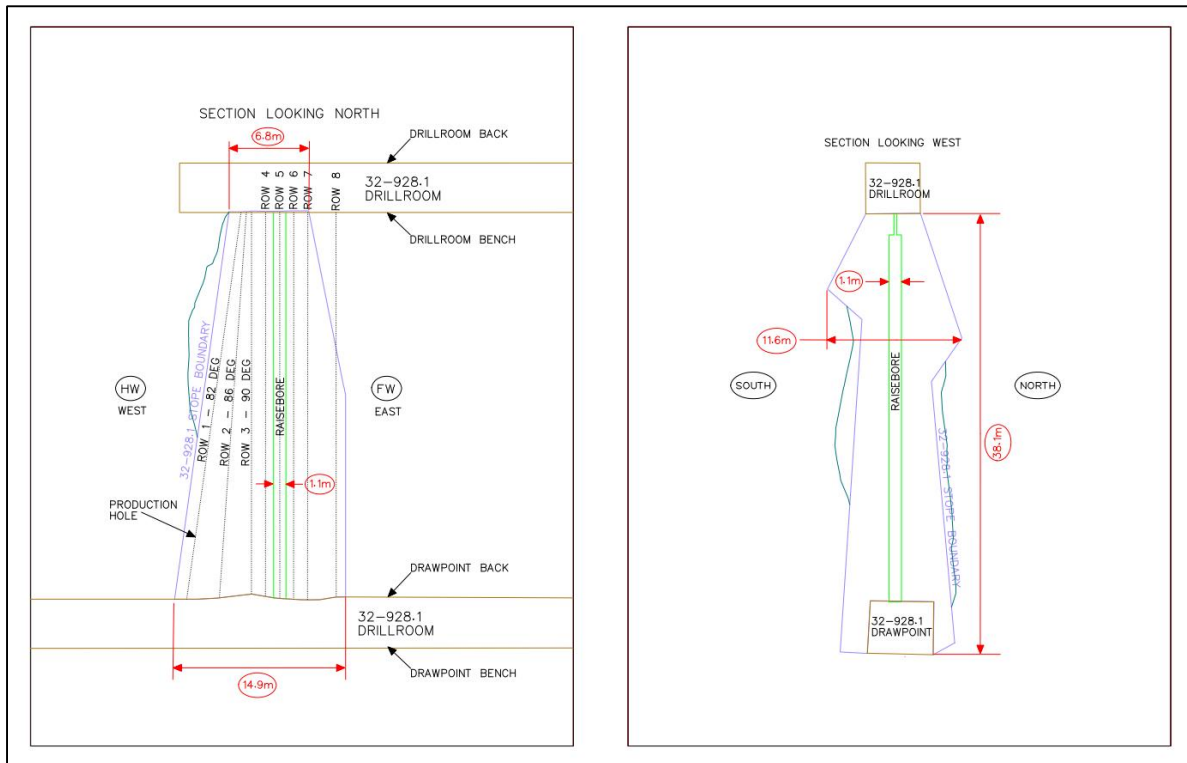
Longsection and cross-section of the 32-928.1 stope
